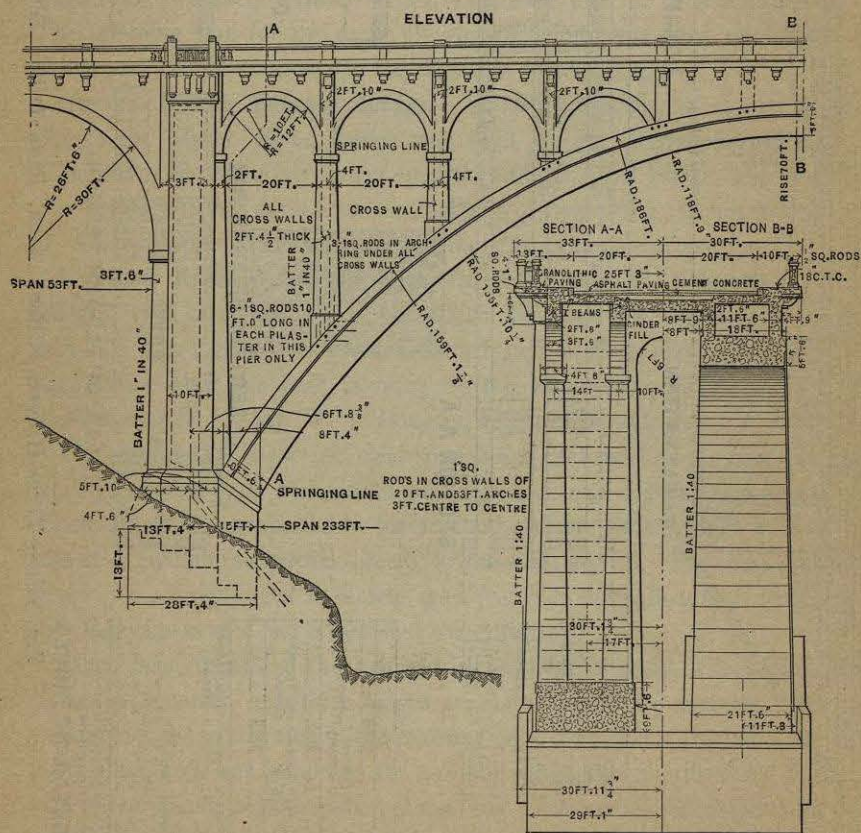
Walnut Lane Bridge, Philadelphia. (See p. 592.)
